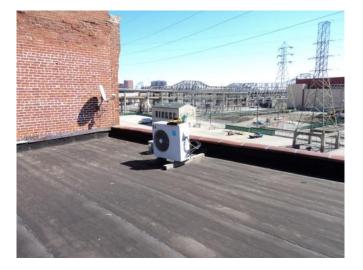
Computer Room Unit (noted Photo E-2 in Figure 4)
